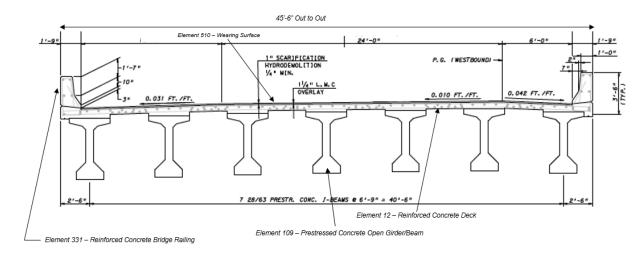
Typical Section of P/S I-Beam Bridge (looking ahead)
